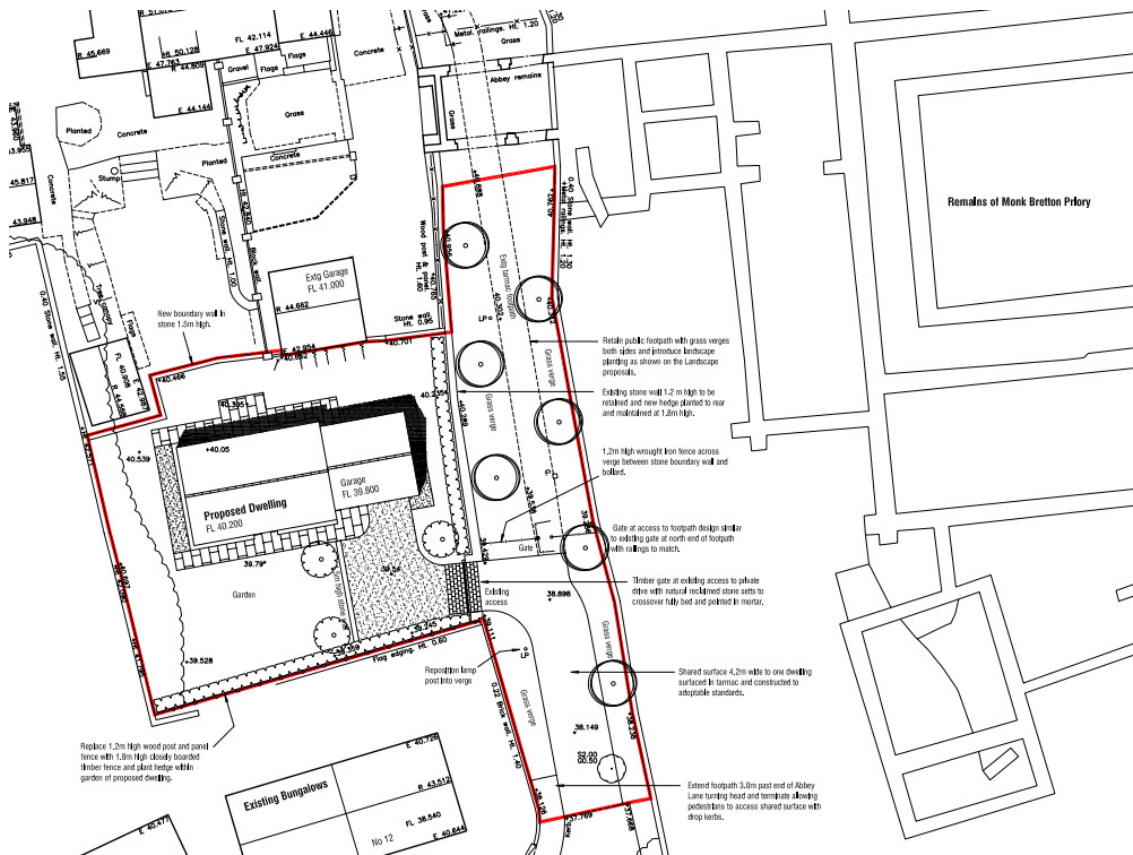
Layout of proposed new dwelling on the site – Extract from Site Plan P02 Rev A.
